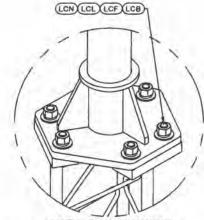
DETAIL B END SIDE PLATE ANGLE CONNECTION
